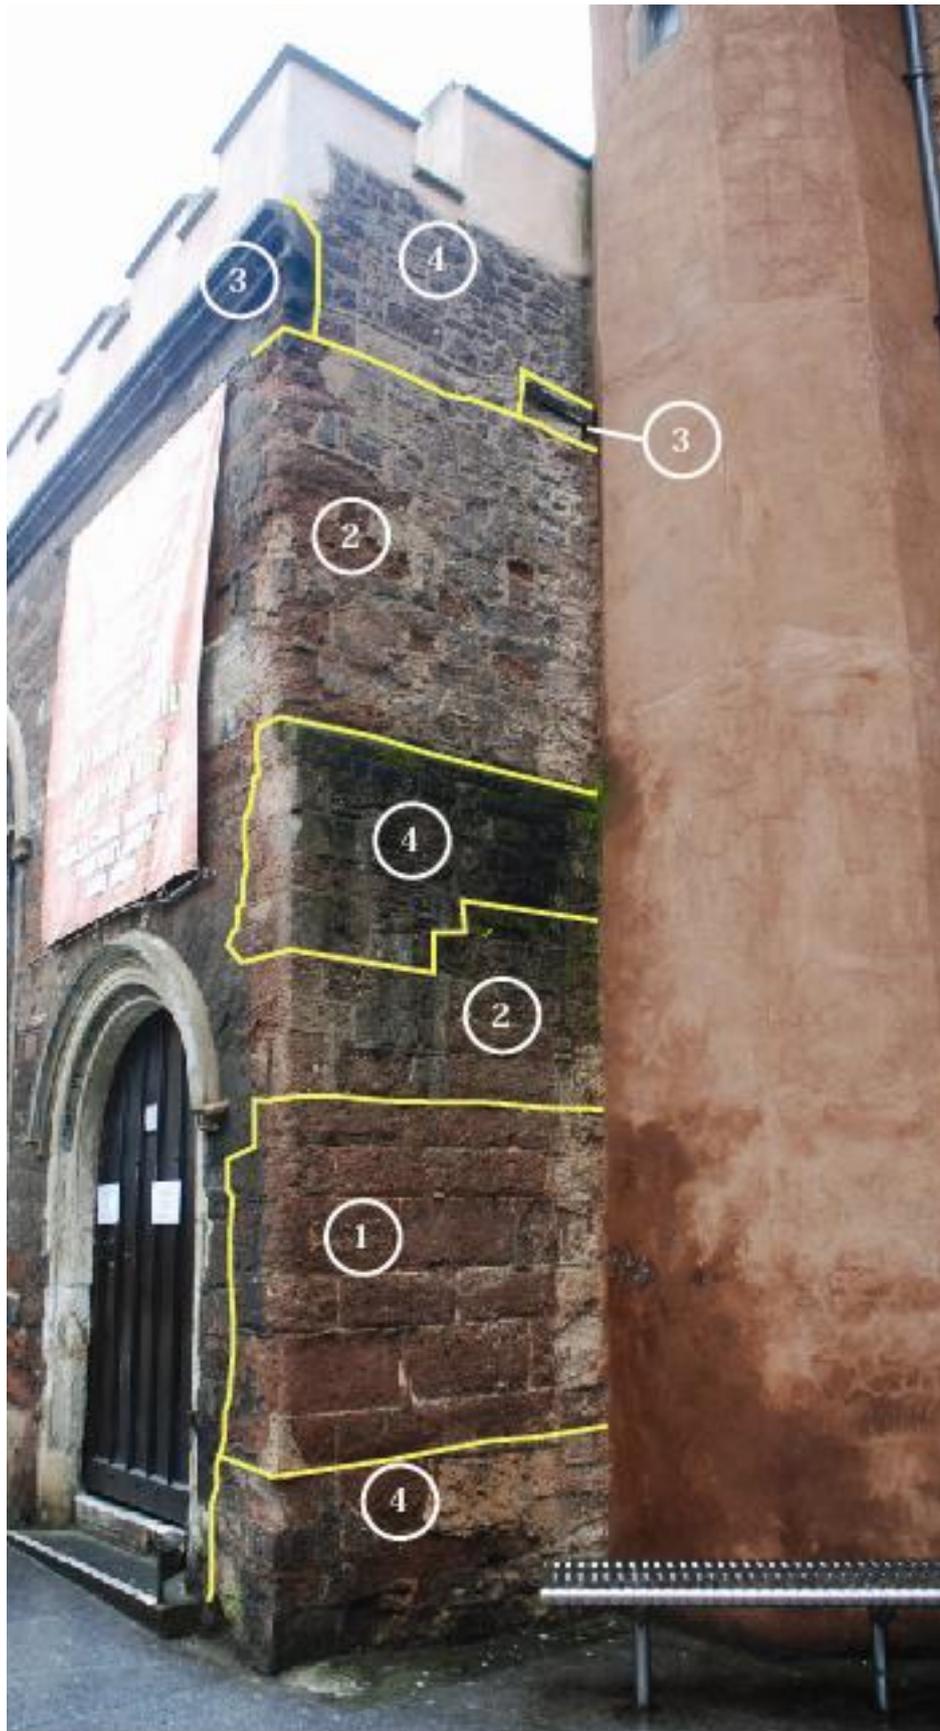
West elevation of north aisle, looking southeast, showing phases of construction.
